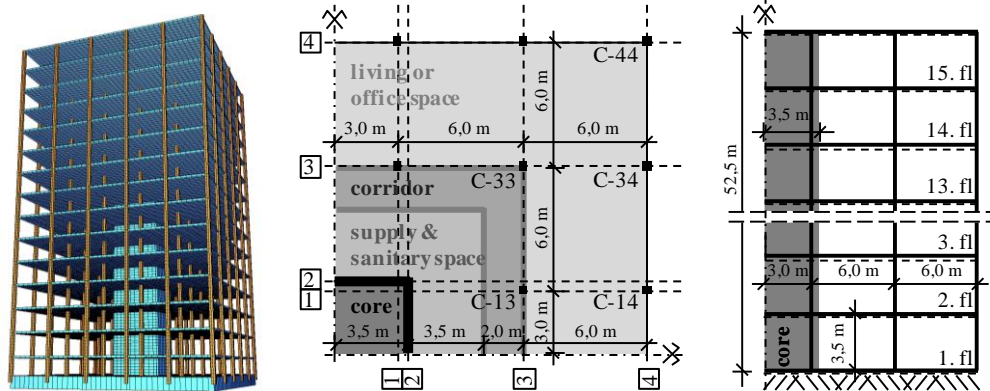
holistic 3D model (left); floor plan (center); vertical section (right)
